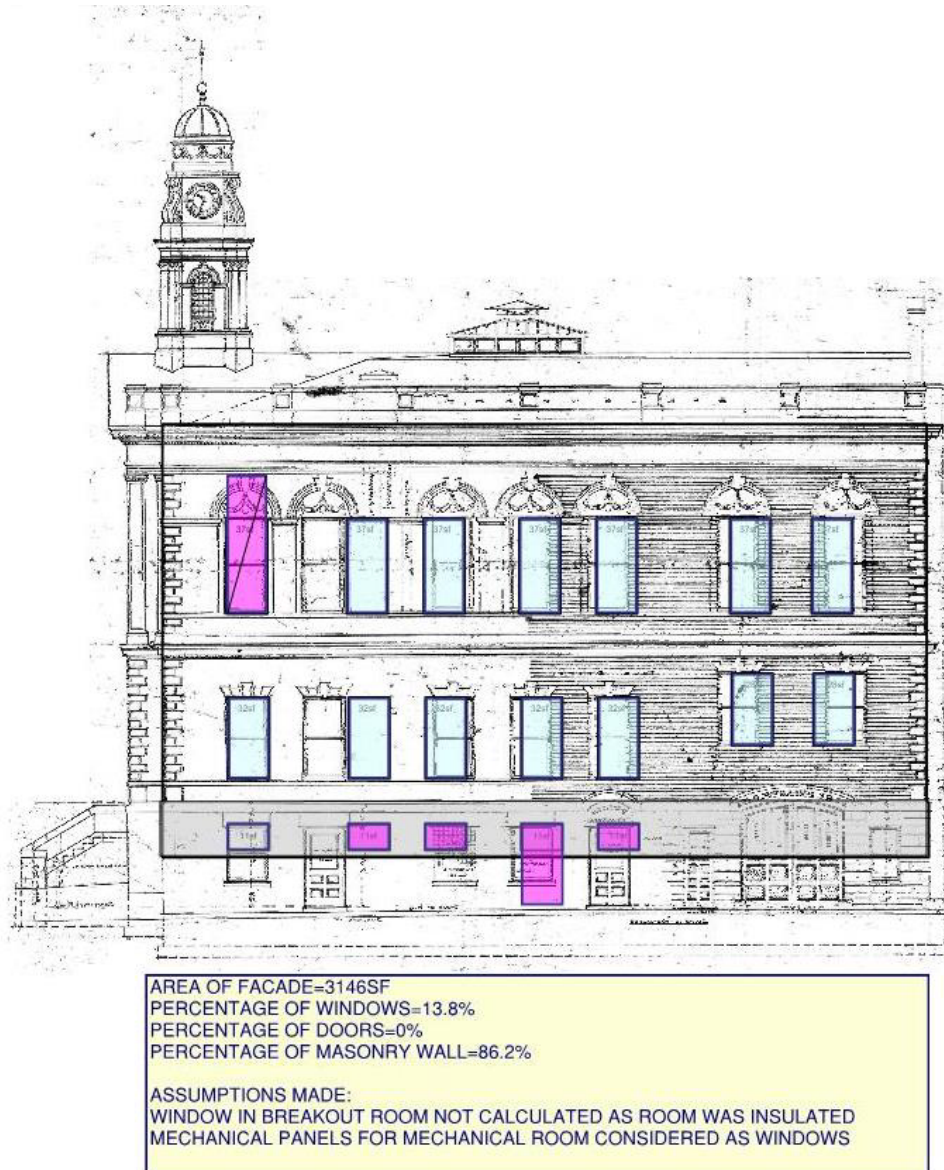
East Elevation (Derived from Original Drawings by Architect)
